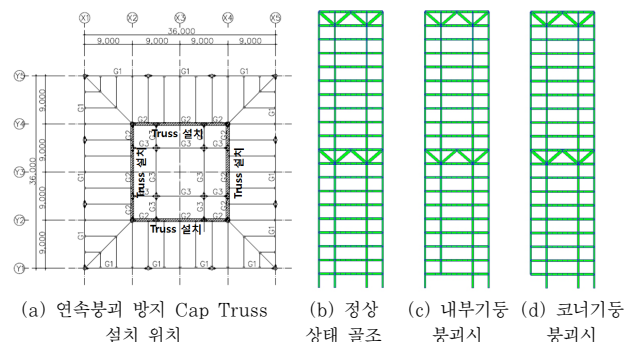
Arrangement of cap trusses and assumed failure case of diagrid structure
